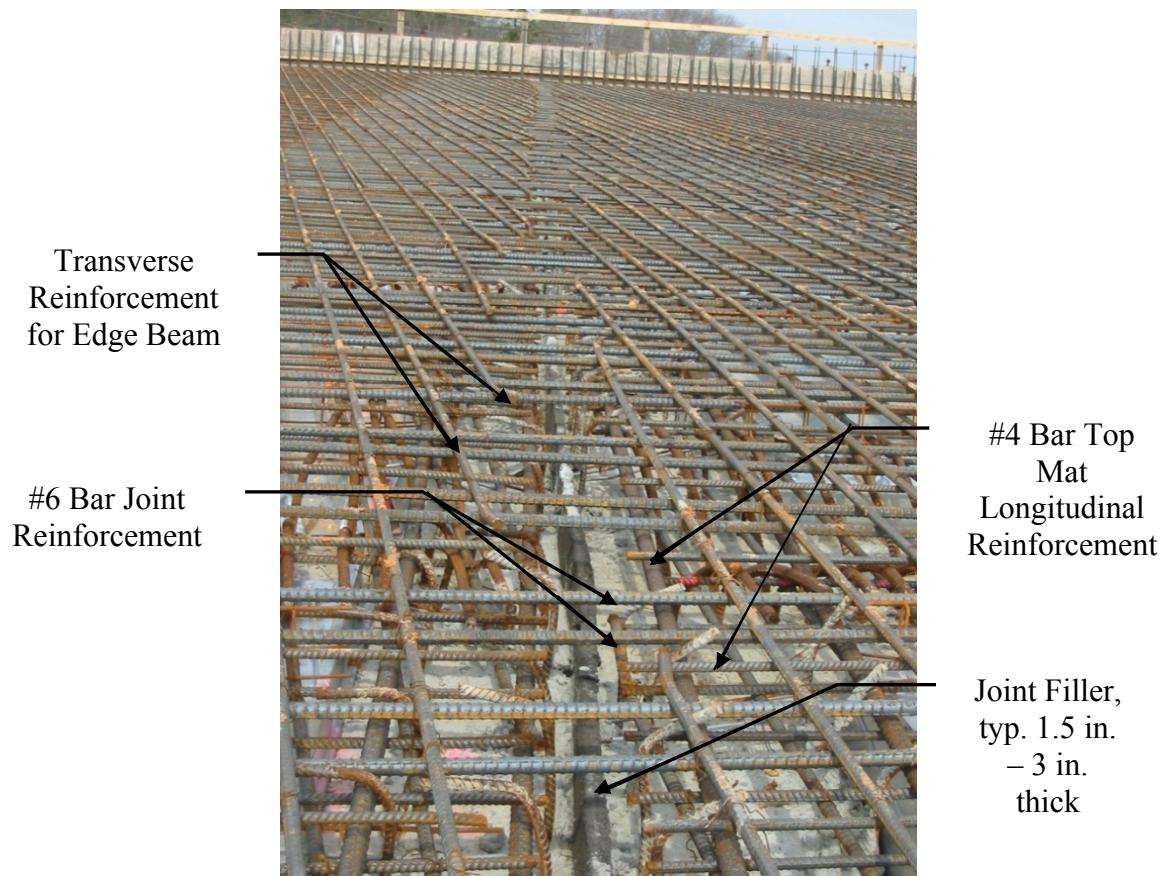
Expanded view of current GDOT continuous bridge deck design detail (bridge supporting US 27 at SR-1, Cedartown Bypass)
